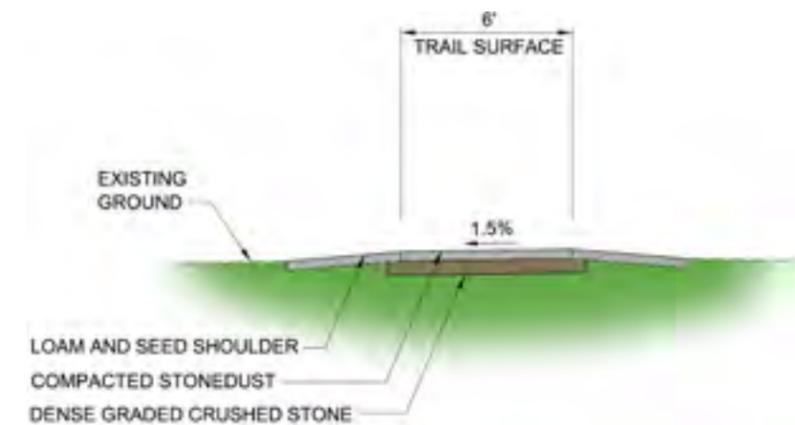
SECTION F-F: TYPICAL GREENWAY TRAIL SECTION
